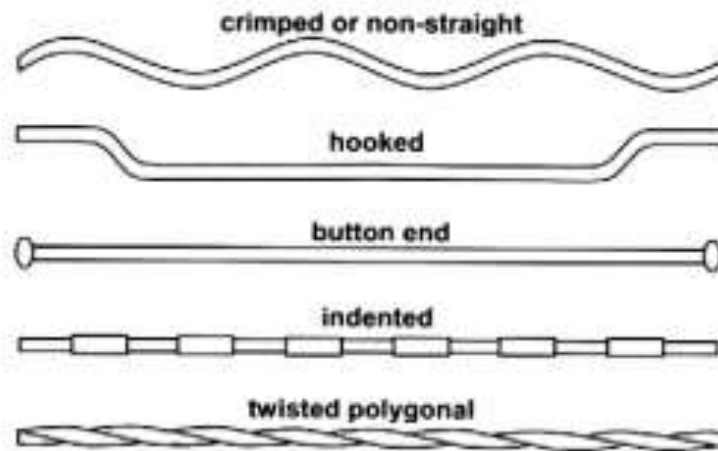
Plate III: Examples of deformed steel fibres (Brandt, 2008)
